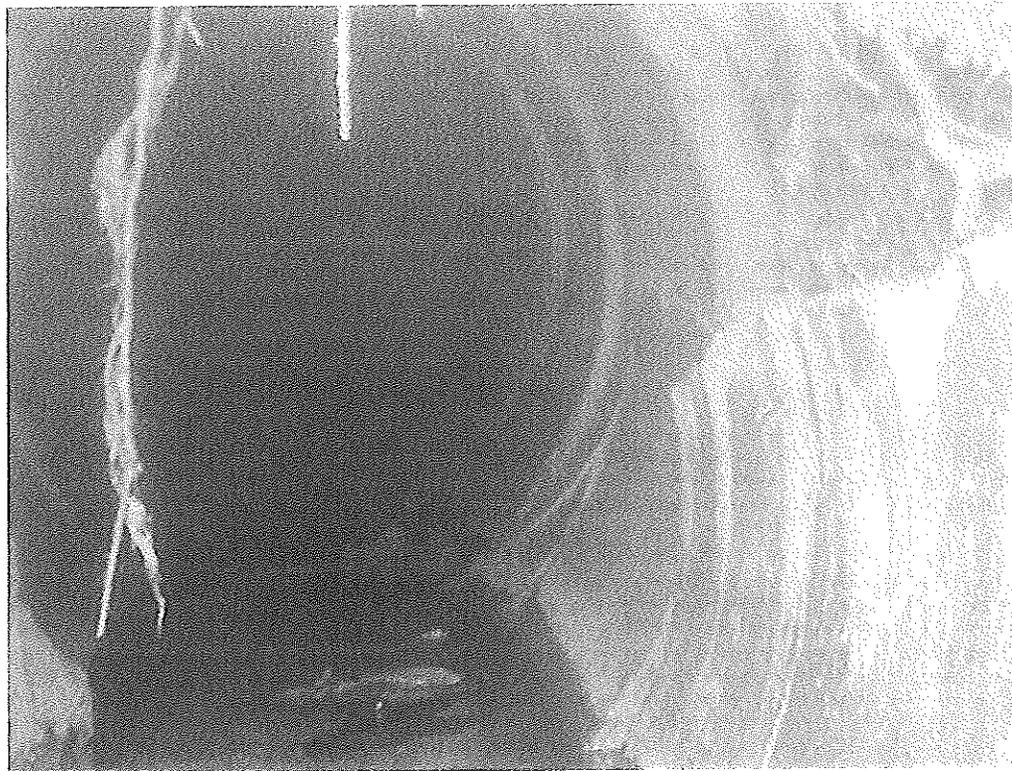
Outlet Drainage Pipe At Rear Of Playground Adjacent To Senior Housing
